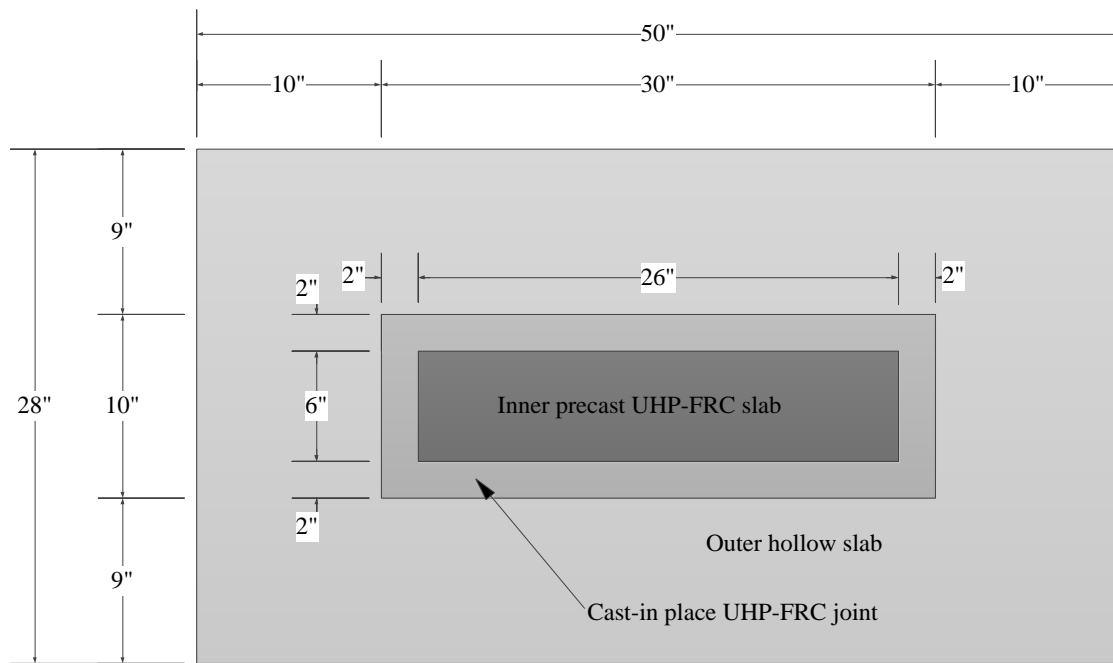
15 Specimen details for punch test specimen with an inner precast UHP-FRC slab and a cast-in-place UHP-FRC joint.
